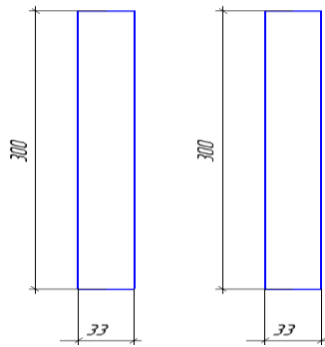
Geometric dimensions of models of camouflage pile foundations in section
